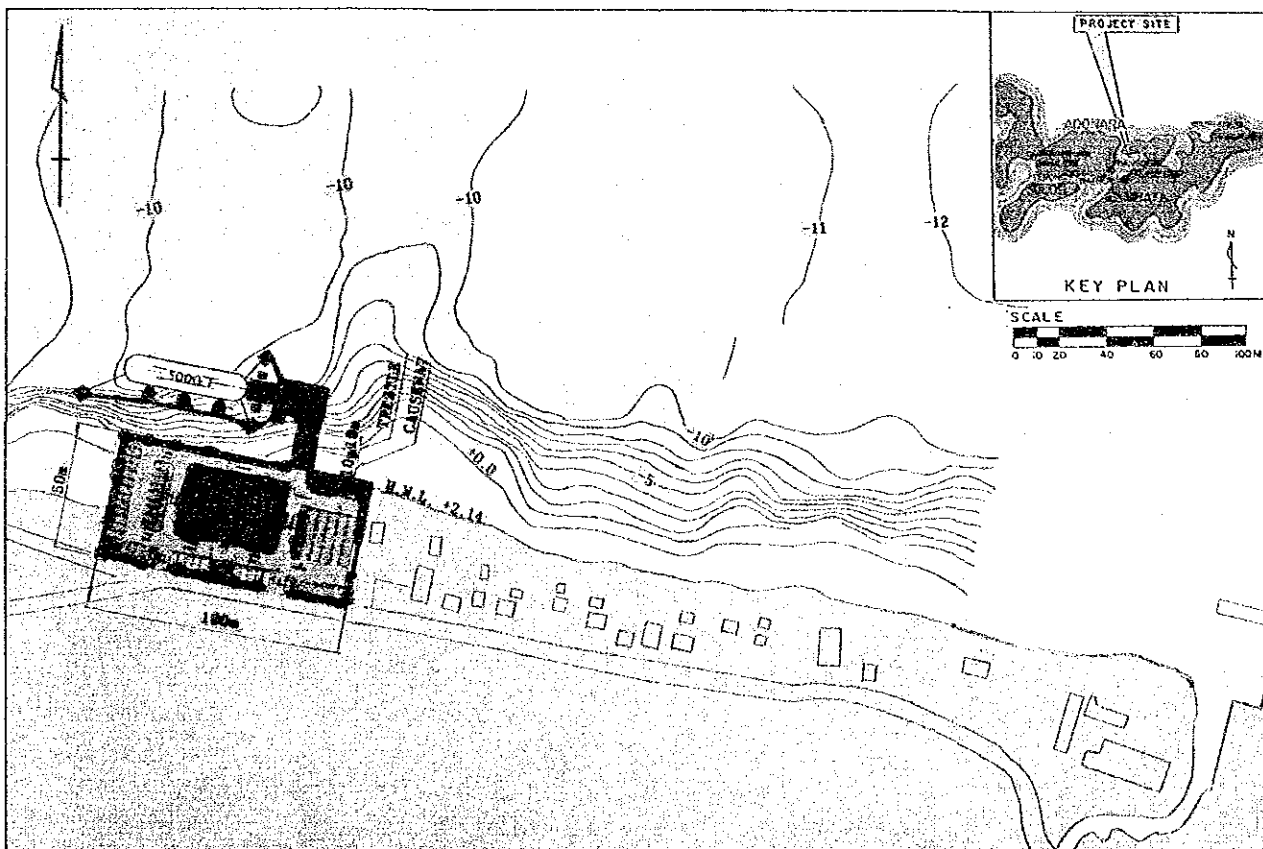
Layout of Lewoleba Ferry Terminal
